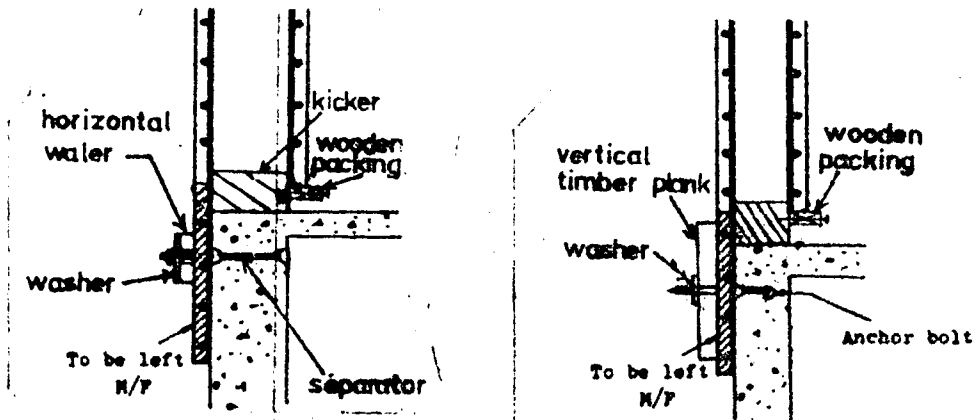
TO BE LEFT M/F ARE USED TO SUPPORT THE FORMS FOR OUTER FACES OF PERIPHERAL WALLS, COLUMNS & BEAMNS
